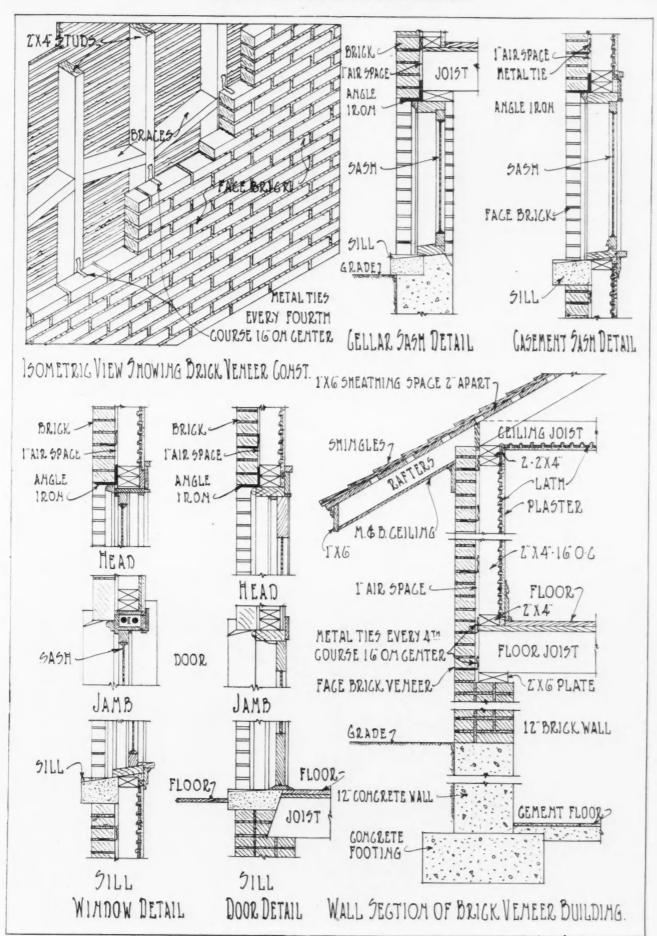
Details of Wall Construction, Including Window and Door Details of Face Brick Veneer Over Braced Wood Frame Without Sheathing. The Least Expensive Face Brick Construction for Residences and Other Small Buildings.
